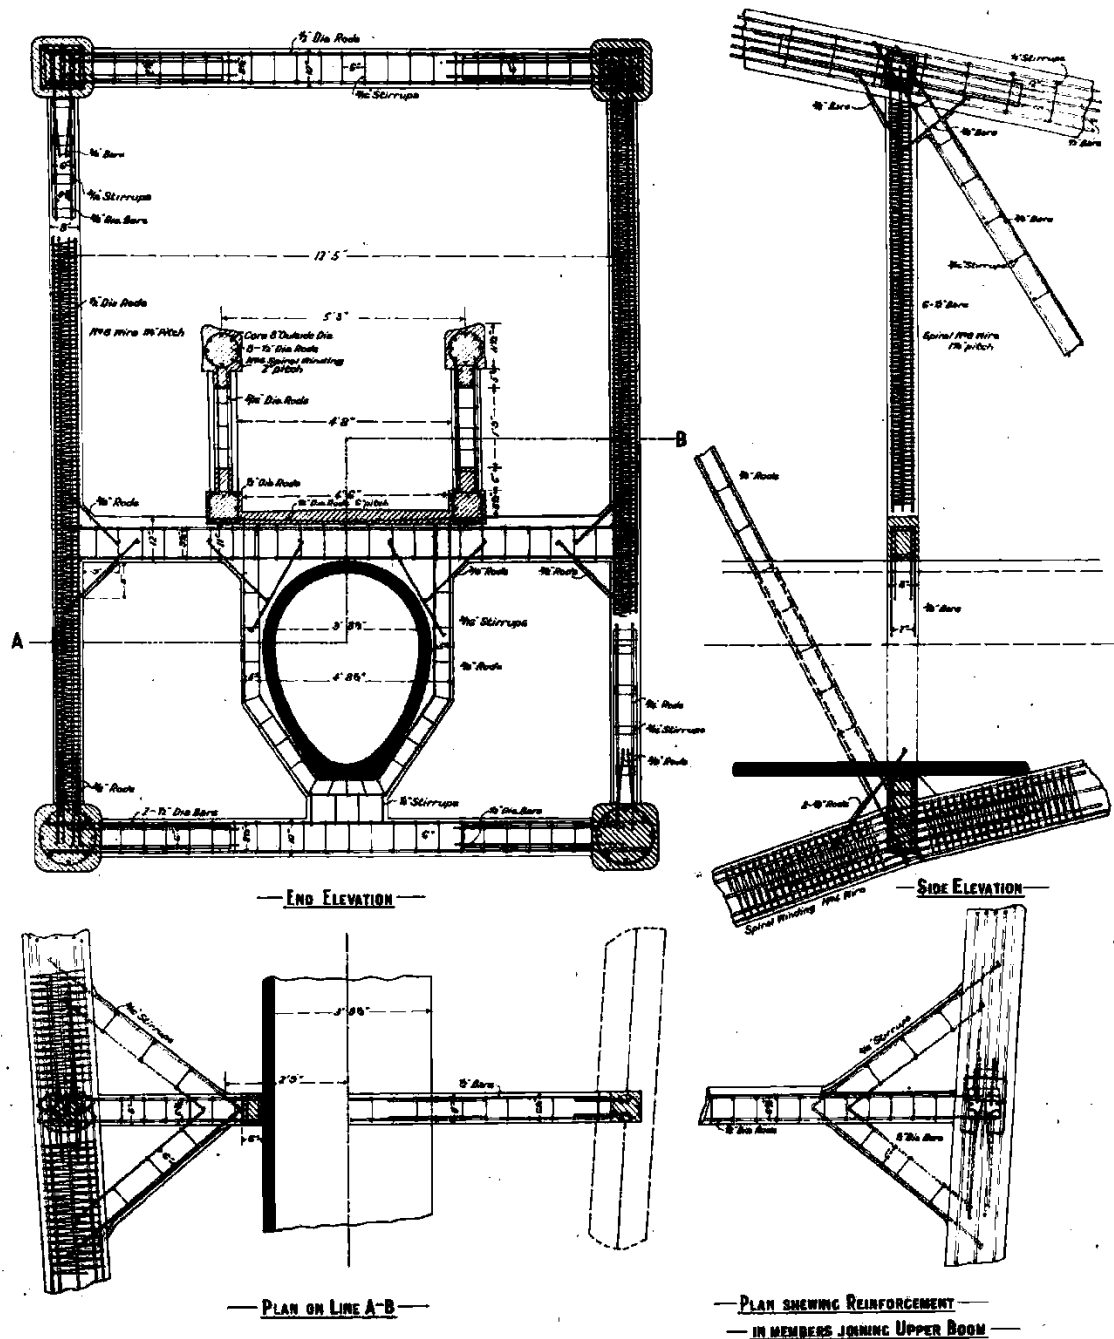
Truss cross-section details, Stone & Siddeley construction documentation, c. 1913
